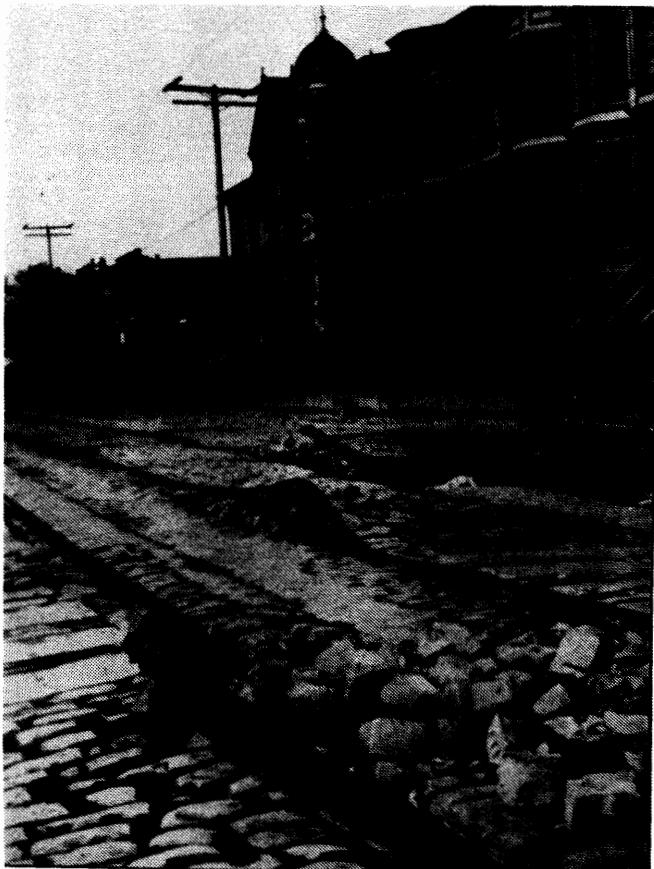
shows two examples of ground failure caused by weak sensitive soils resulting from the 1906 San Francisco earthquake. Figure 2.16 shows an example of soil foundation failure at a two-story supermarket building in San Antonio, Chile, that settled about one foot during the magnitude-7.8 Chilean earthquake of 1985.
